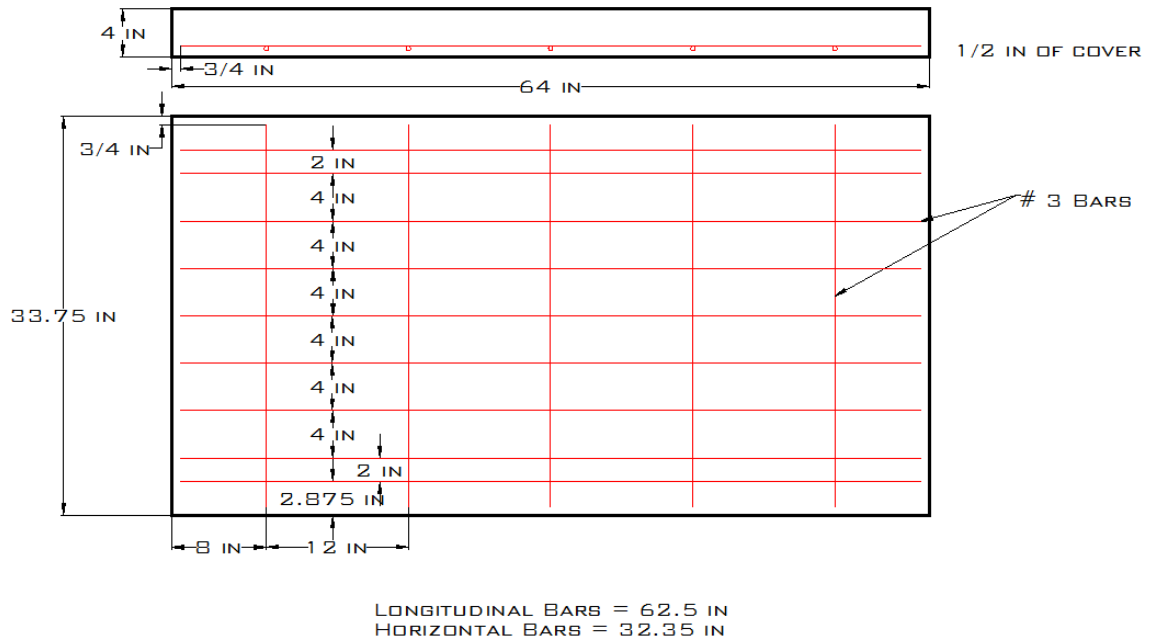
Overall concrete slab dimensions and reinforcement layout.
